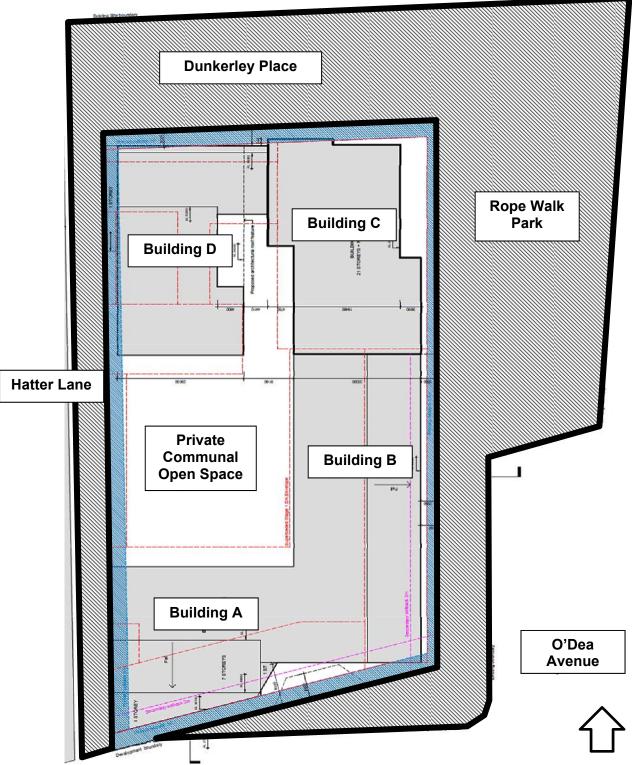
Site Plan illustrating proposed Building footprints, around private communal open space and future public domain and dedications (dashed area).
